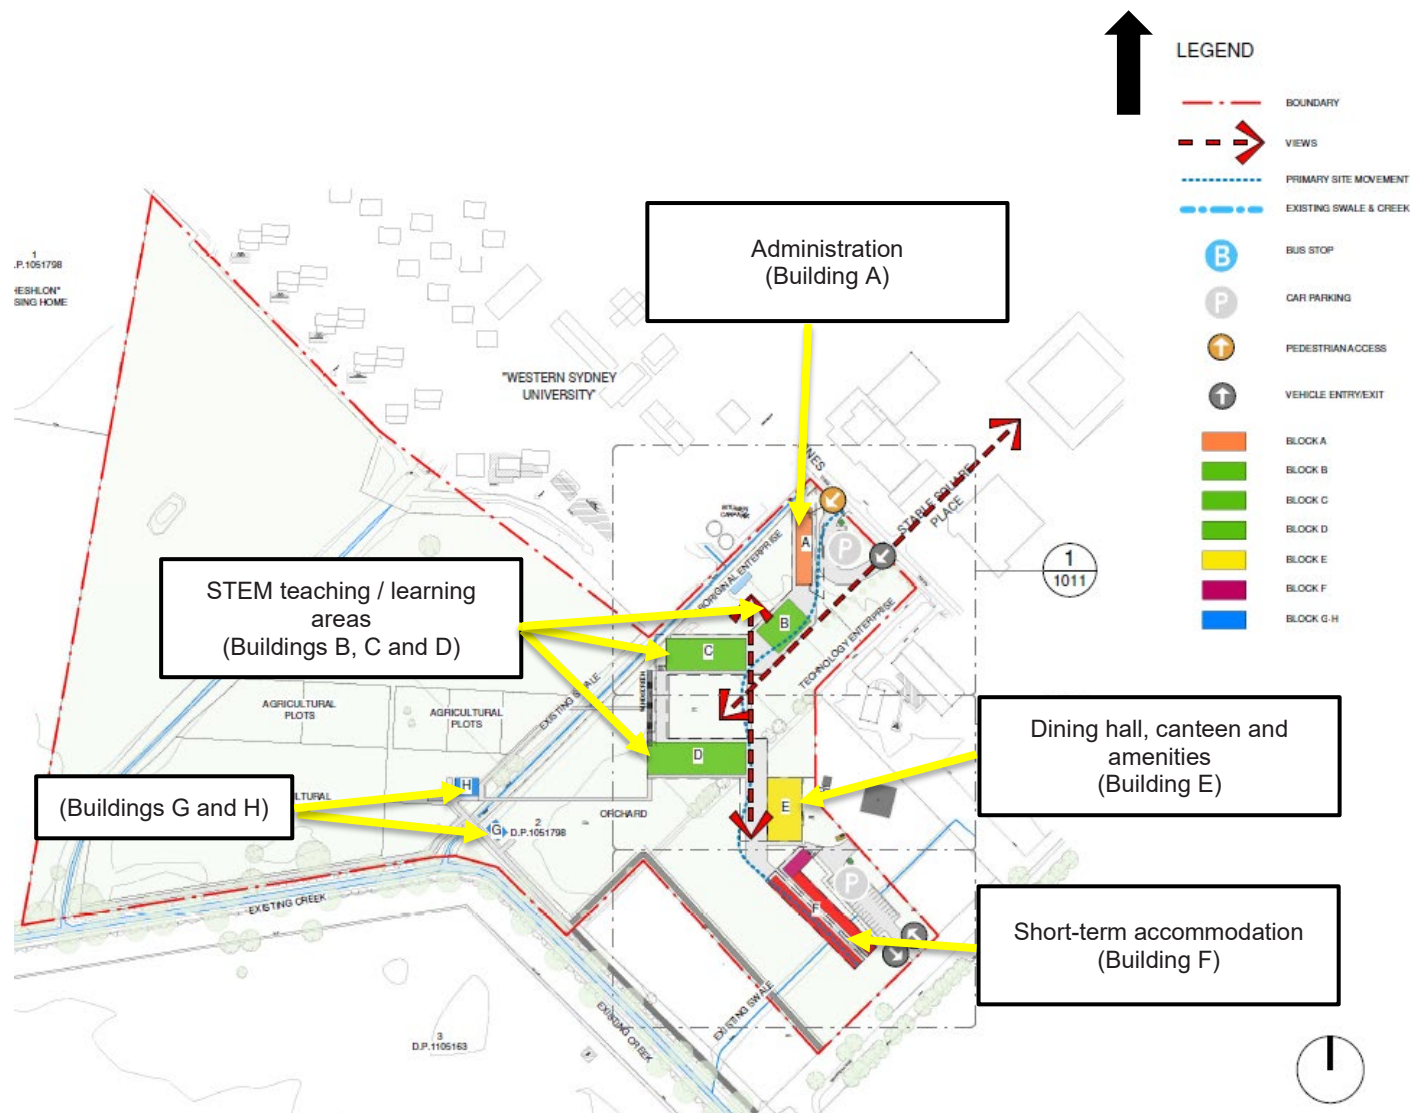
Proposed Site Plan (Source: NBRs and Partners)
